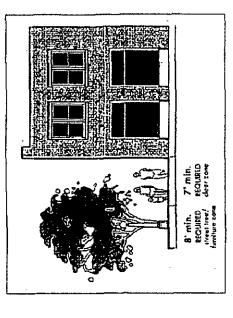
Sidewalk Requirements in TOD Mixed Use District. Street trees are required in this District with an average spacing not greater than 30 ft on center.
